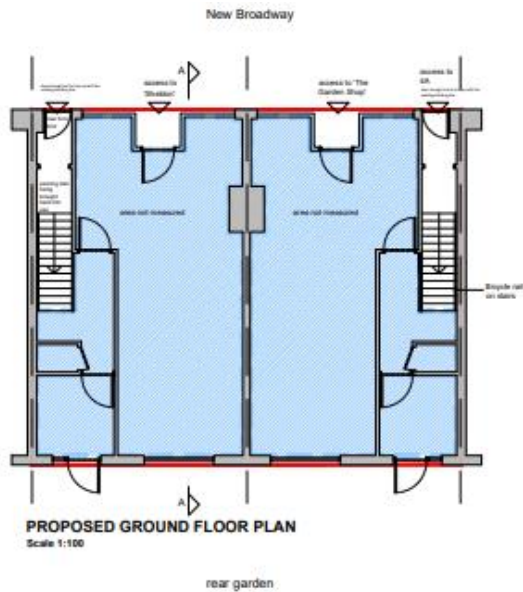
Proposed Ground Floor Plans 17/2957/FUL
